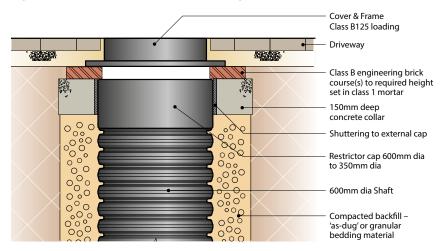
Installation detail for B125 loading: paved areas with limited traffic load
